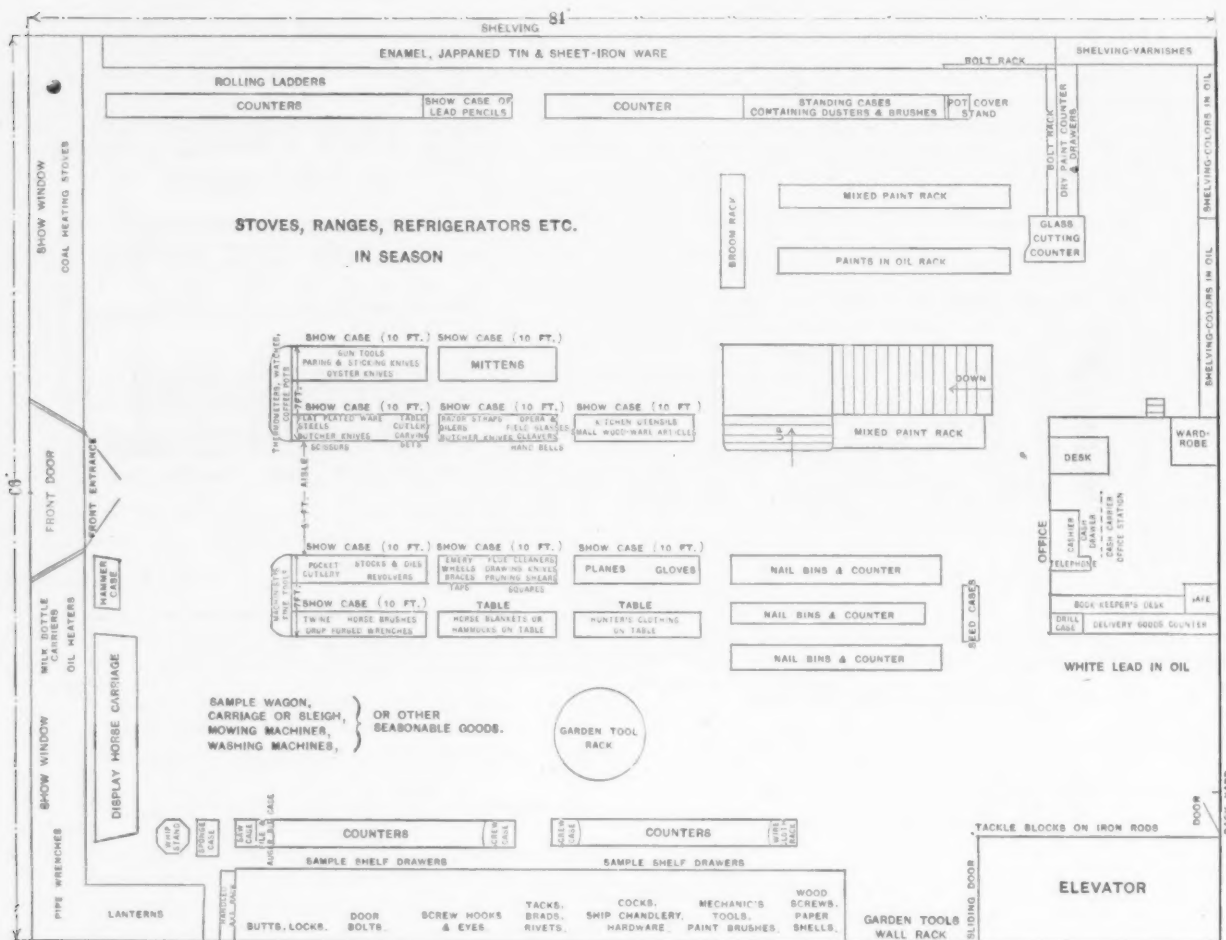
First-Floor Plan of Lockwood & Palmer's Store.
